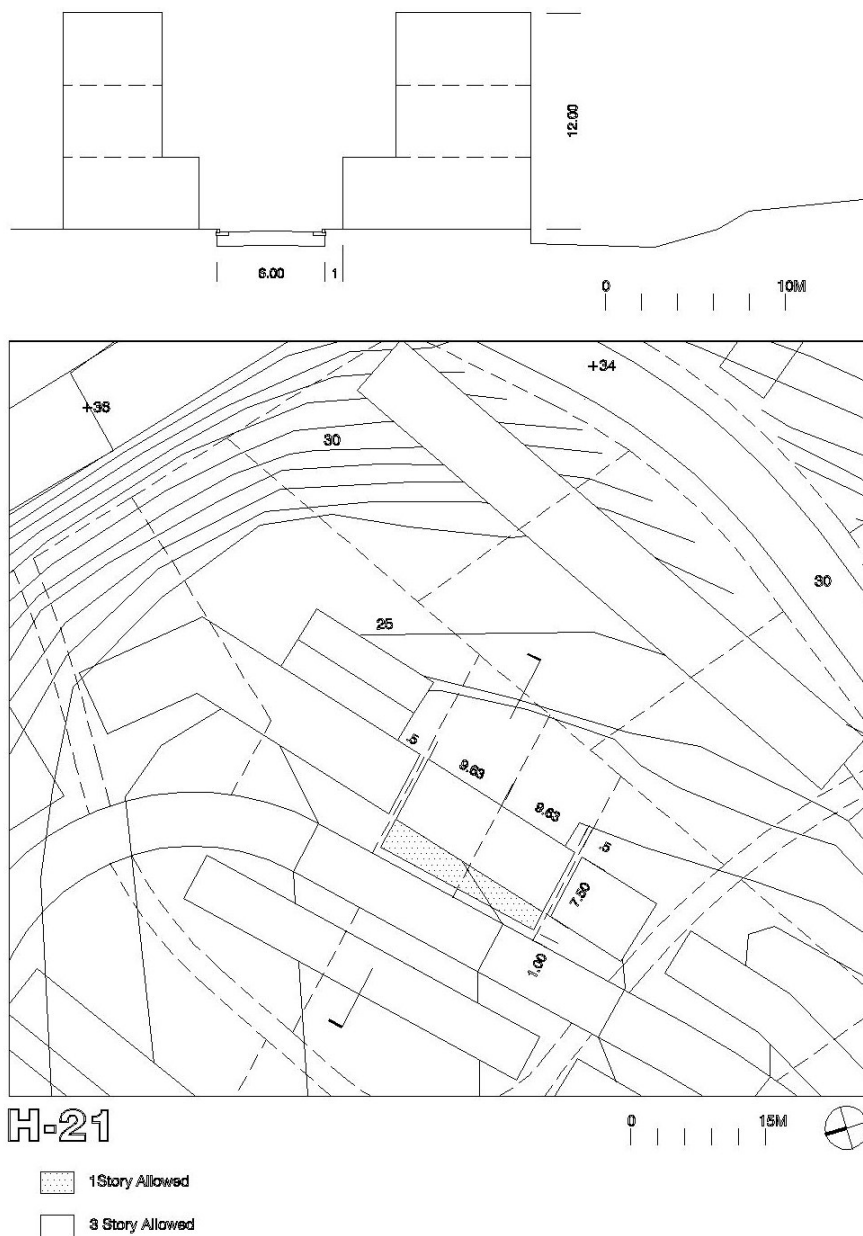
Site H-21. This site allows two 3-story bar type buildings.
